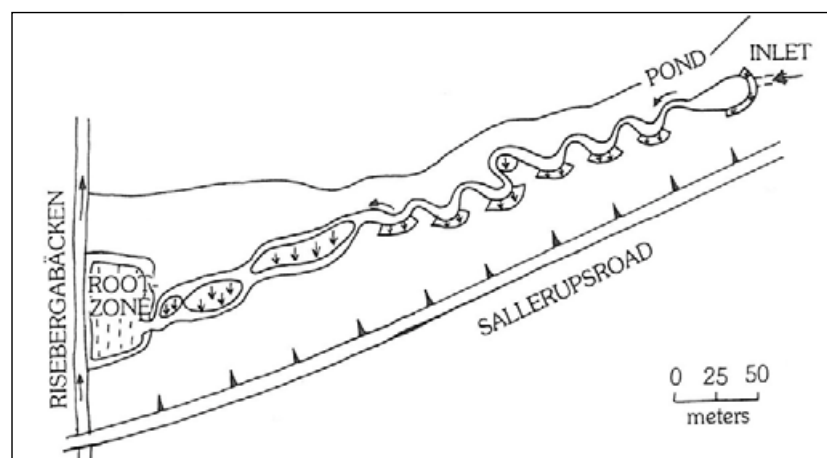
General layout of the Sallerupsvägen Drainage Corridor
